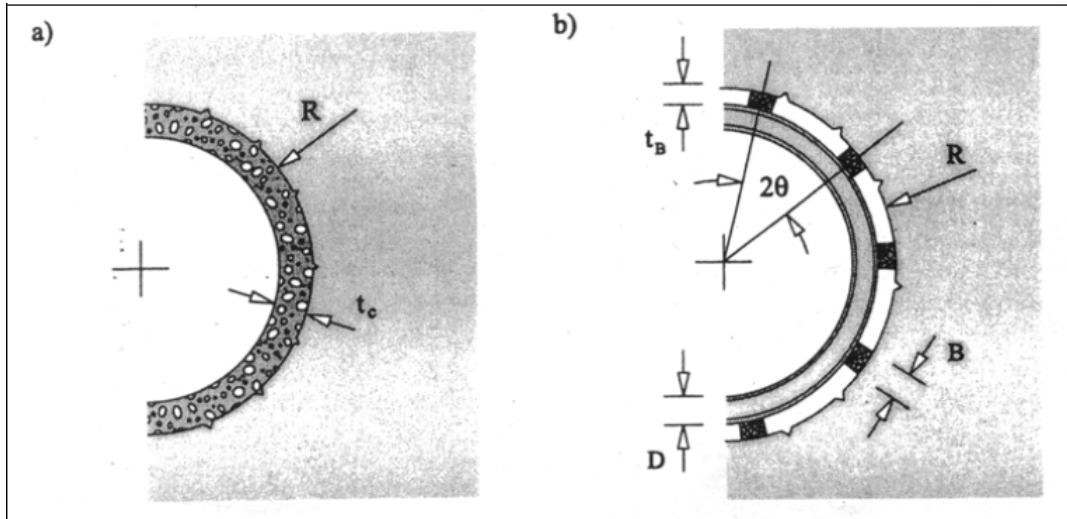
Sections of two types of tunnel support systems: (a) shotcrete or concrete rings, and (b) steel sets modified from Brady and Brown (2006) [55]
